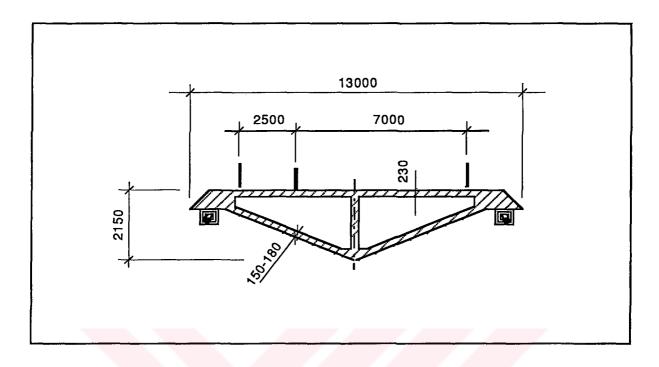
CROSS SECTION OF THE BRIDGE DECK (In meters)
